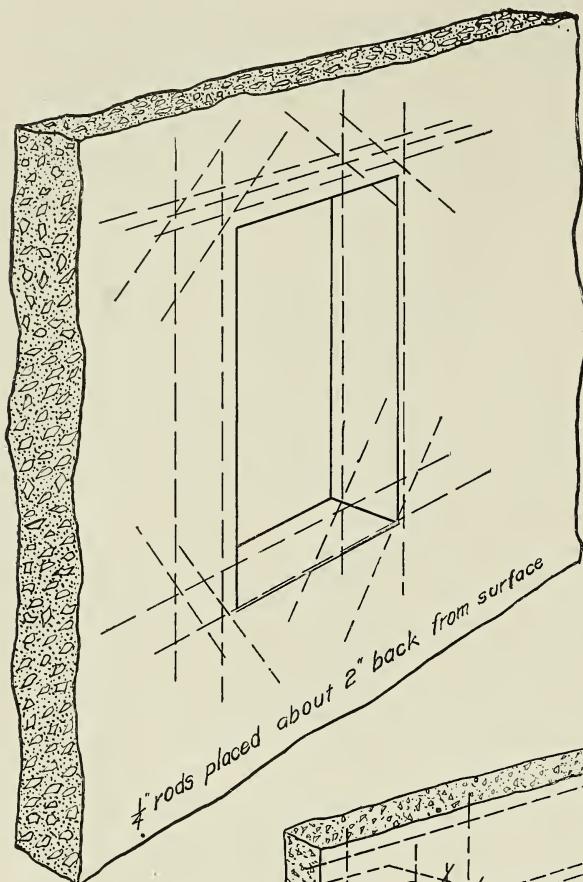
Method of placing reinforcing rods around wall openings less than 4 feet in width.
